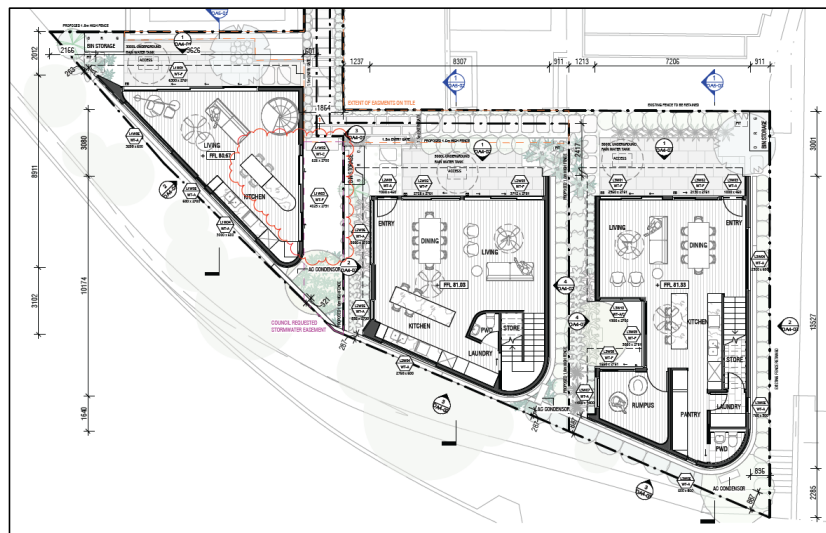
Proposed Ground Floor Plan (Source: Modscape Architects)
